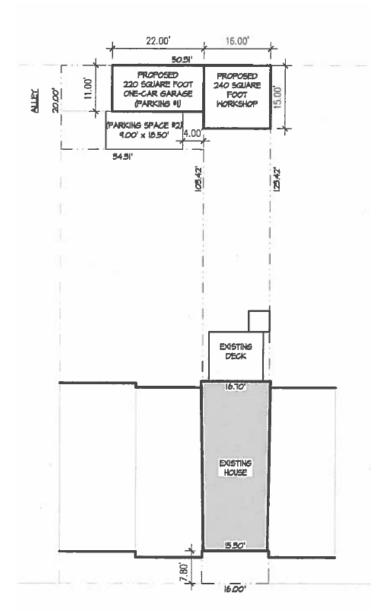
Site plan showing proposed structures of 210 South Fayette Street
